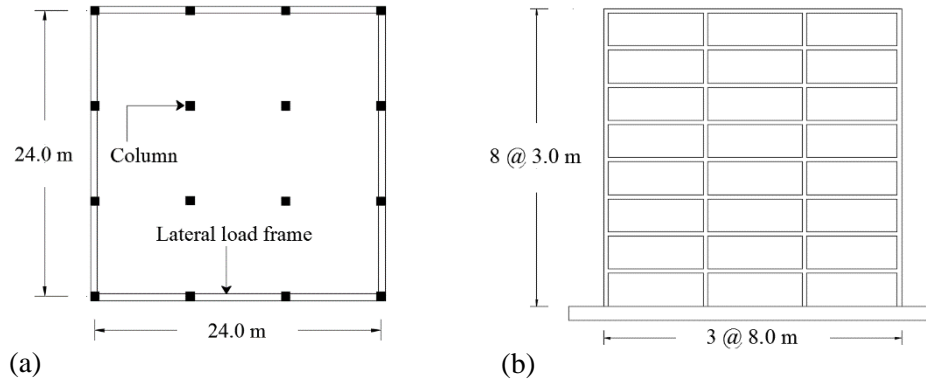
(a) Plan of case study buildings; (b) Elevation of 8-story SMRF system.
